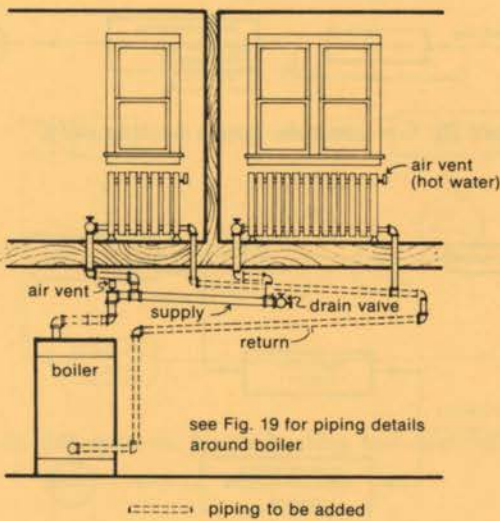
Piping to be added when converting a one-pipe steam system to a two-pipe hot-water system.
